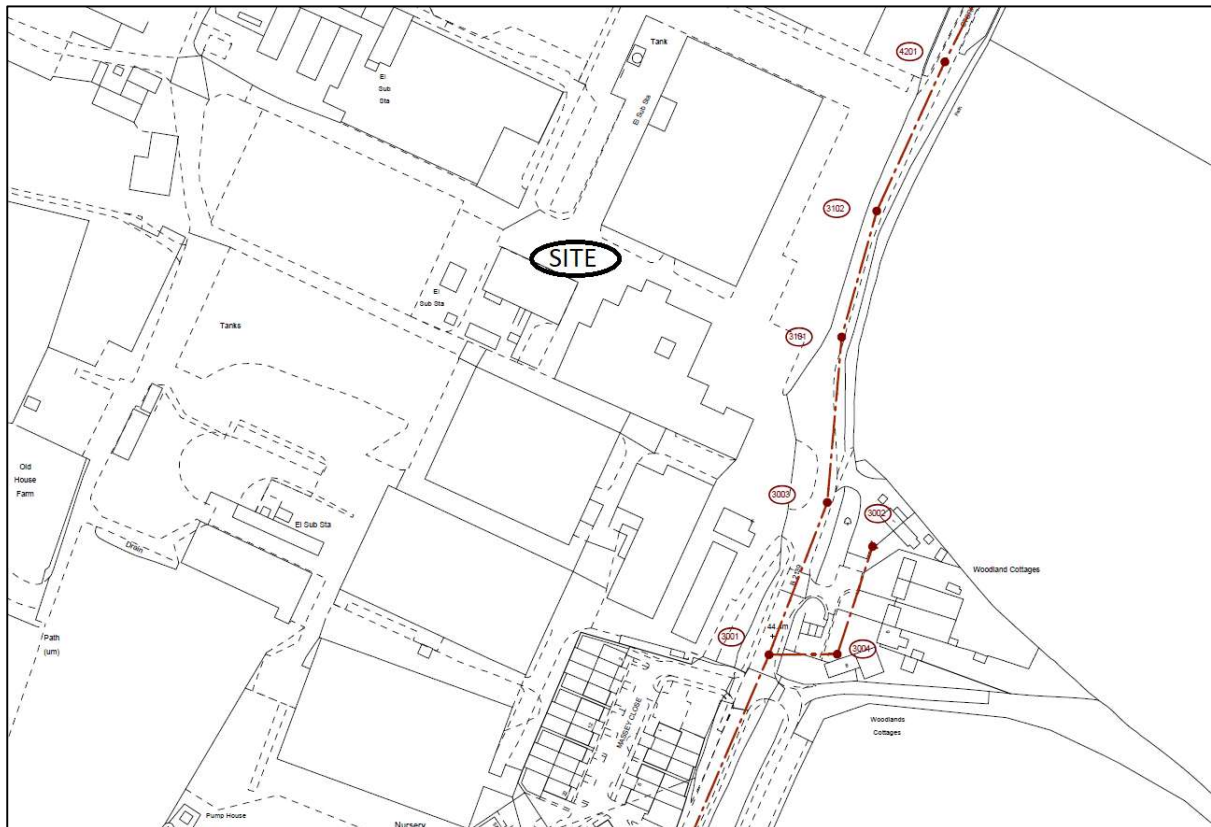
Sewer Asset Plan Extract (Source: Southern Water asset records)
